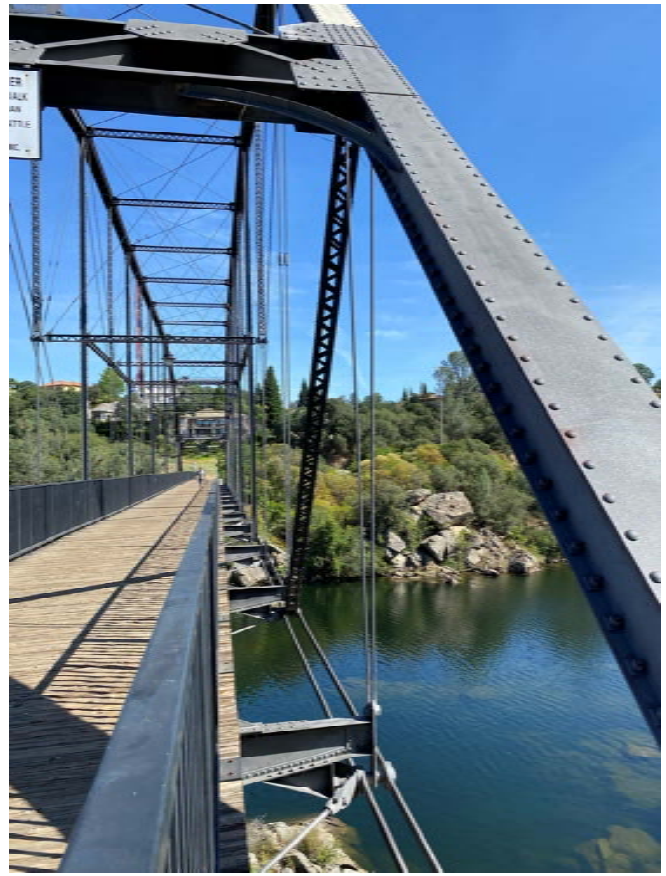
Folsom Historic Truss Bridge with Reduced Deck Width
